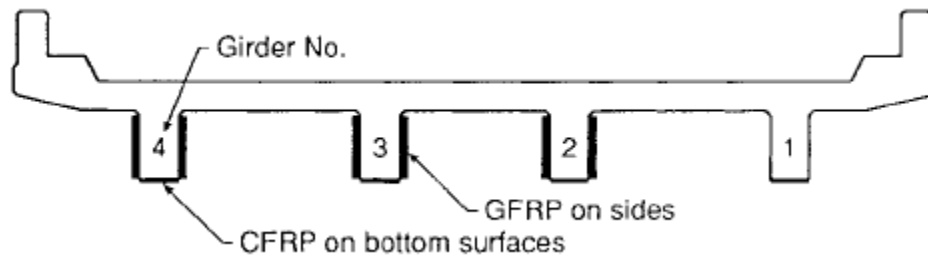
Cross-section of bridge with location of FRP plates (Stallings et al. 2000).
